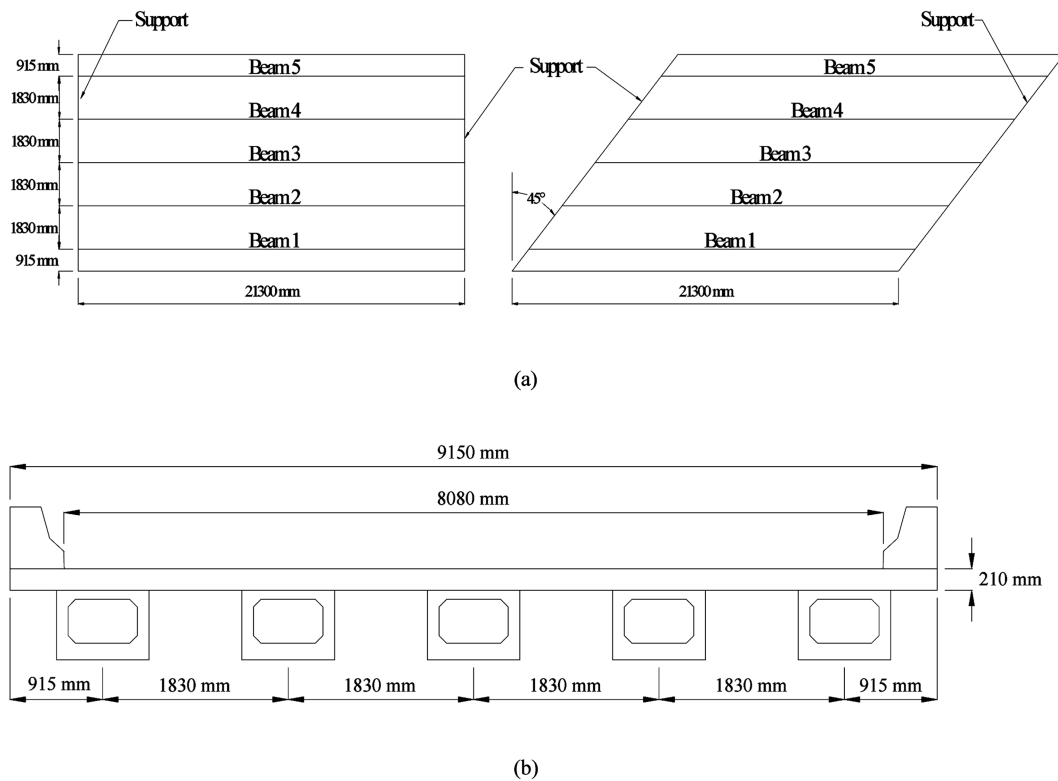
Single-span prestressed box-beam bridge: (a) plan view and (b) typical cross section
